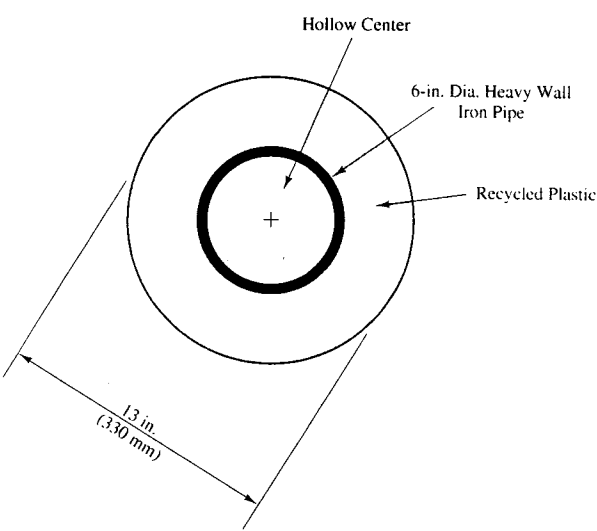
Cross section of a typical plastic-steel composite pile.
